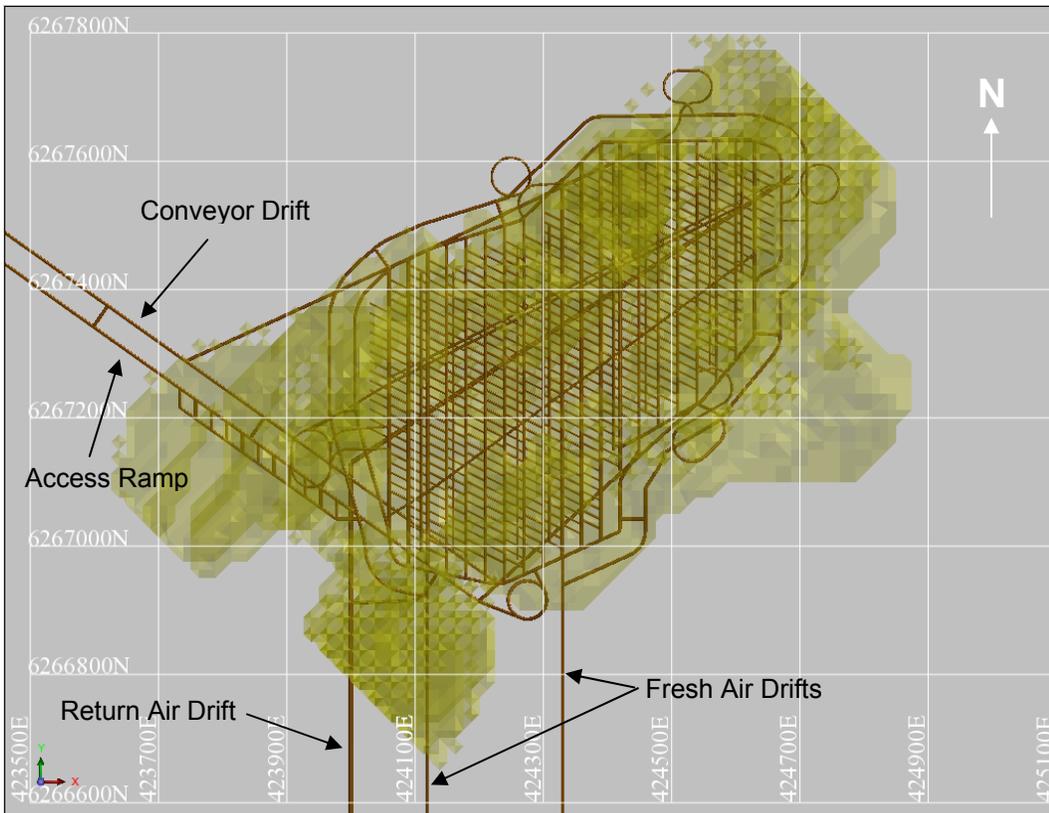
Plan showing mine infrastructure and 0.25 g/t Au grade shell
